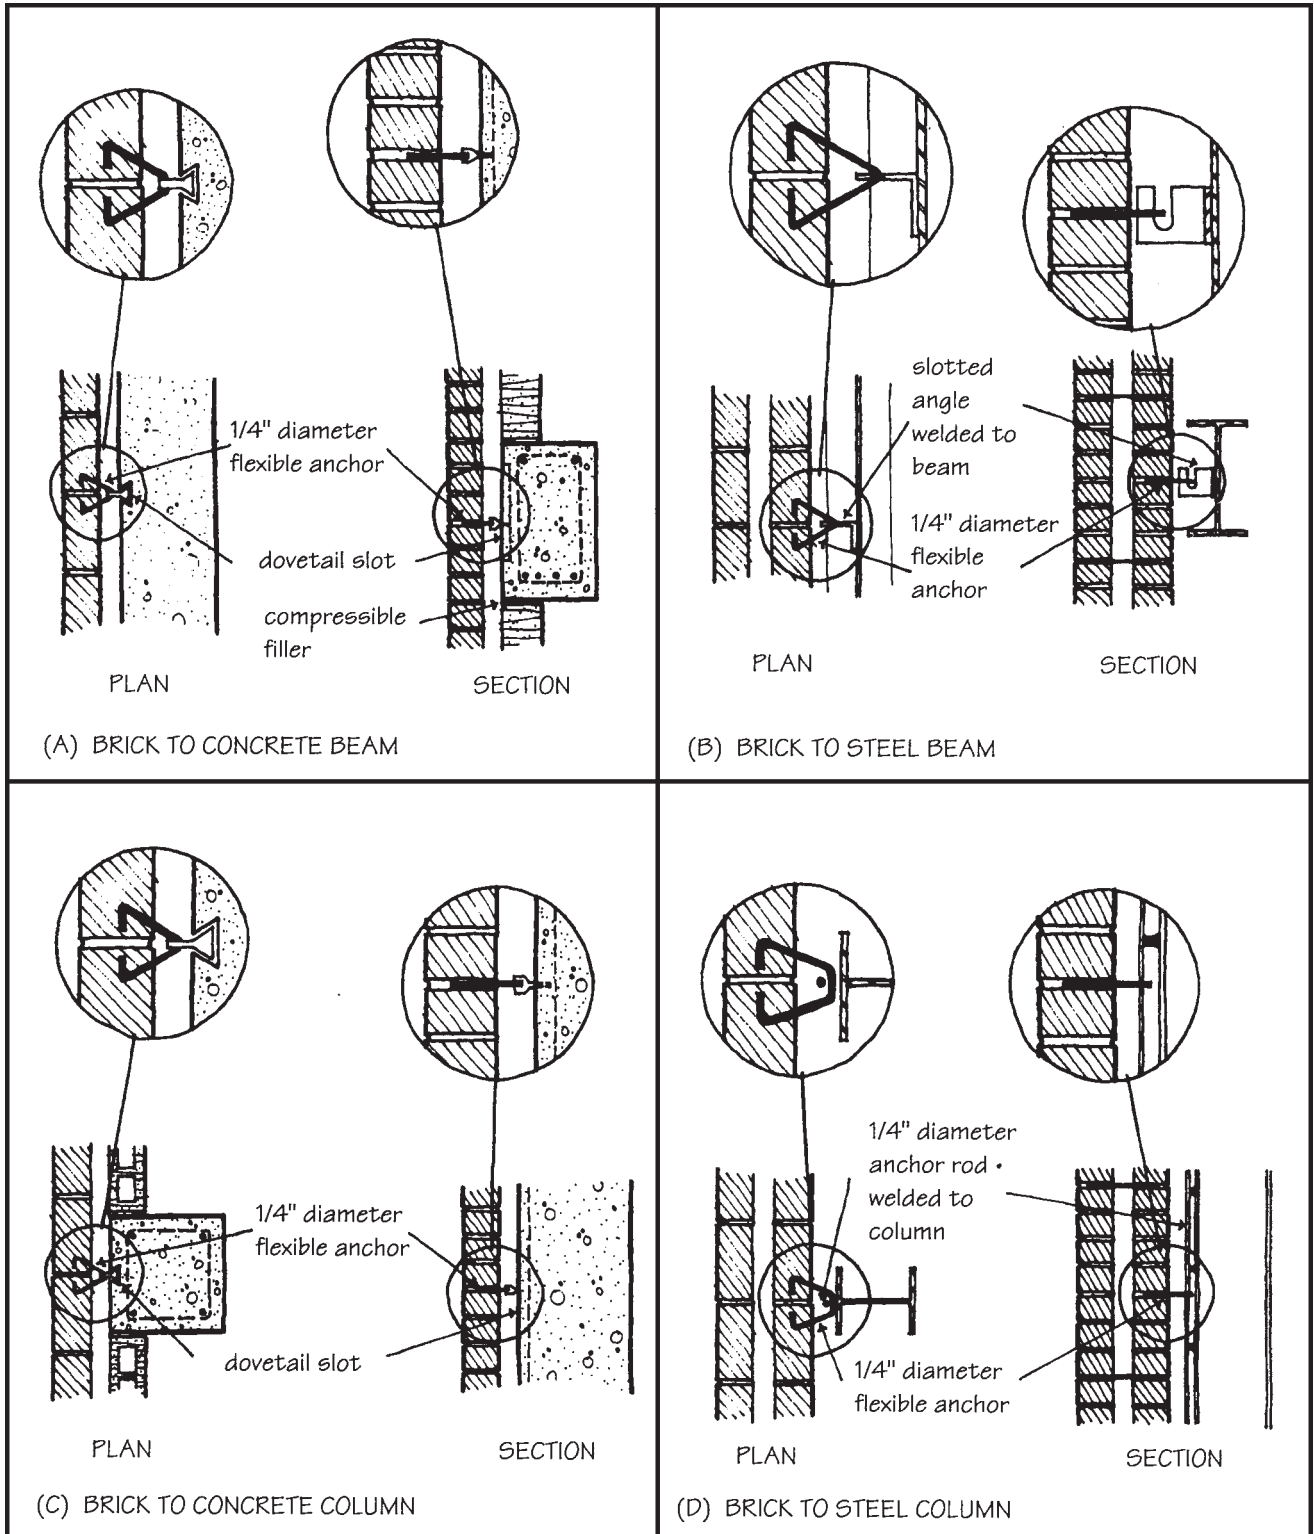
Flexible anchorage of brick masonry. (From BIA Technical Note 18.)
